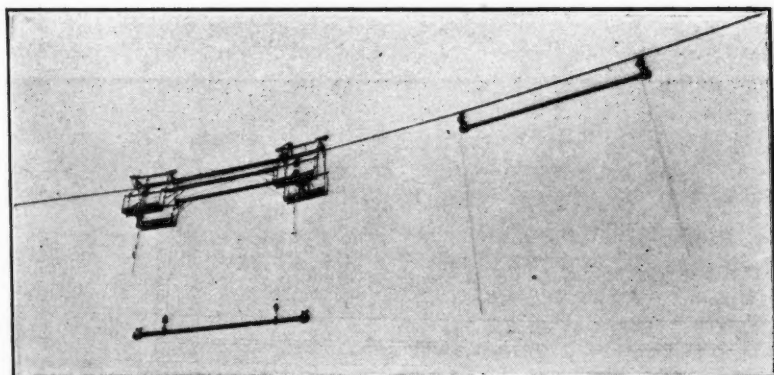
TROLLEY LIFTING SECOND PAIR OF EYE-BARS, FLORIANOPOLIS BRIDGE.
